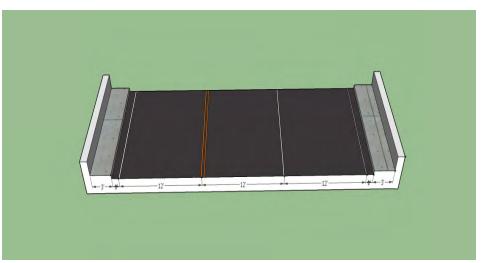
Current design of Bill Kennedy Way bridge over I-20 between Reynoldstown and Glenwood Park
